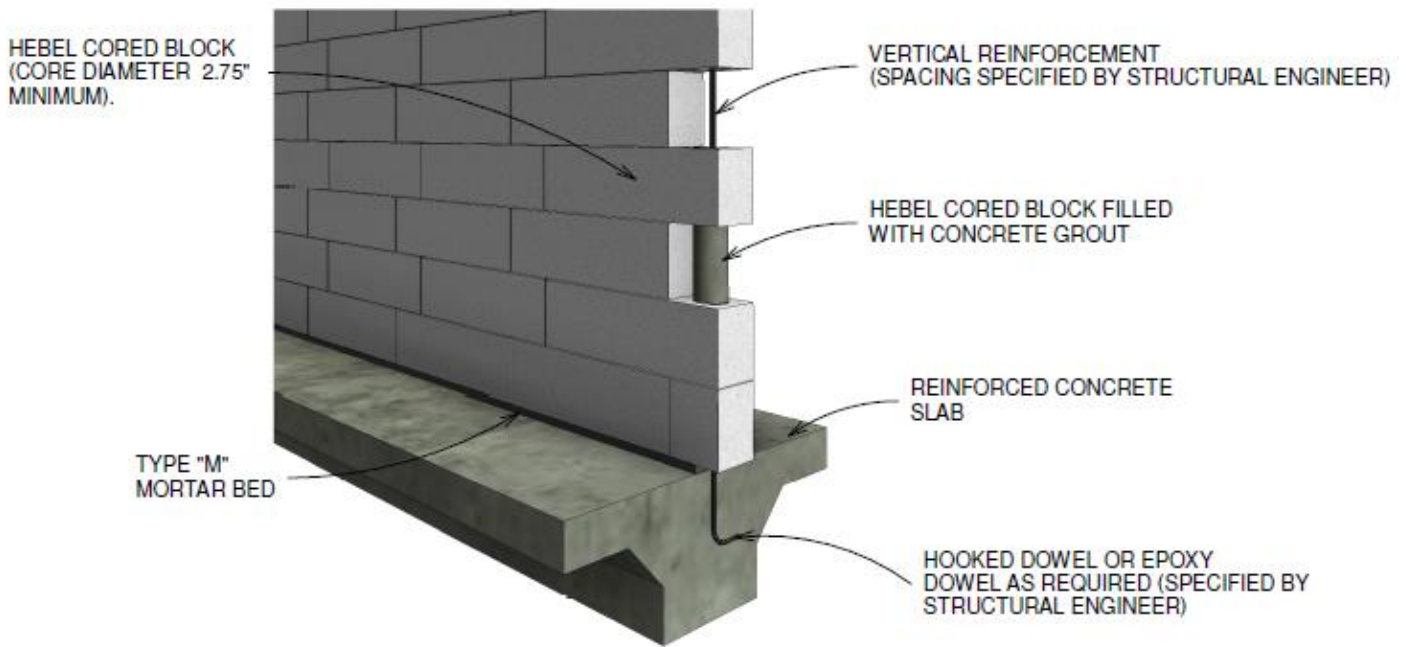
HEBEL MASONRY – SECTION @ FOUNDATION
